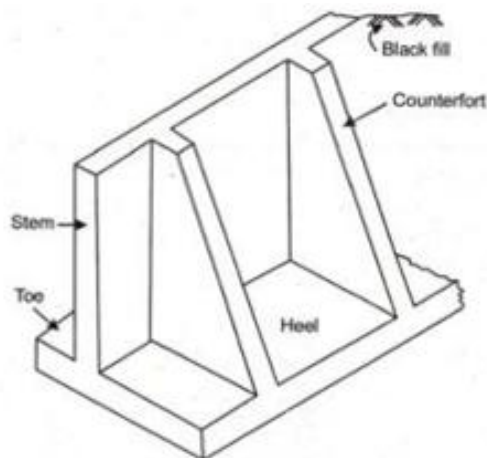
Counterfort wall(Ibrahim, 2018.)
